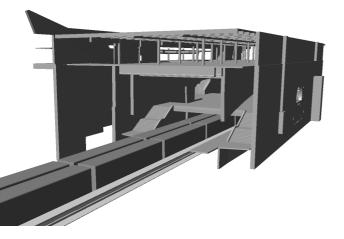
Subway Station, finishing construction works become "hidden" by the walls and slabs
